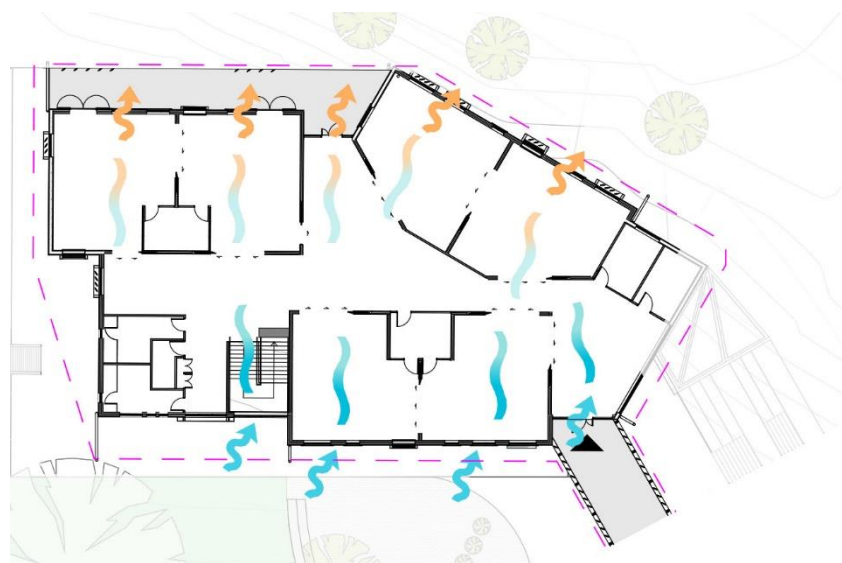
Part plan showing natural ventilation travelling through learning spaces
